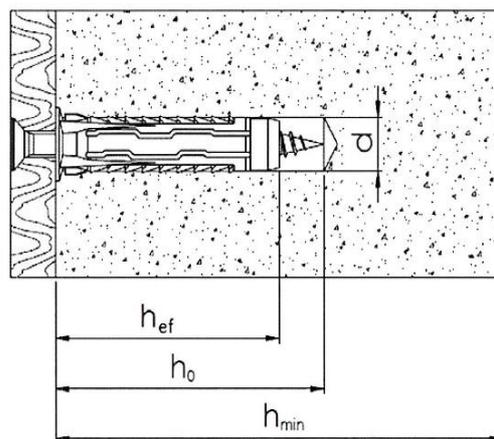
Parameters for installation and arrangement of 4ALL expansion anchors in other substrates
